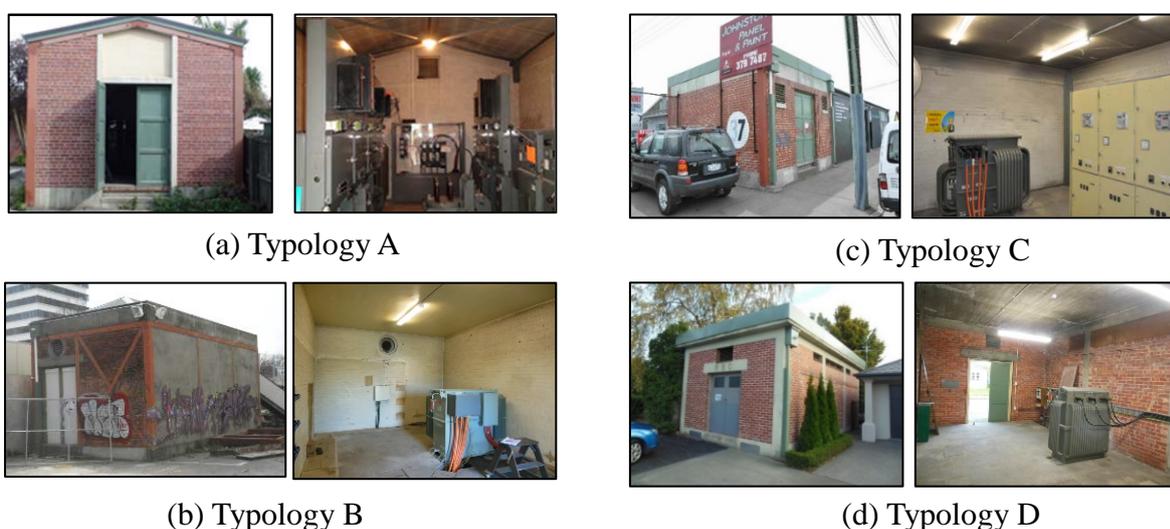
Examples of masonry substation building typologies showing exterior and interior of each building example.
